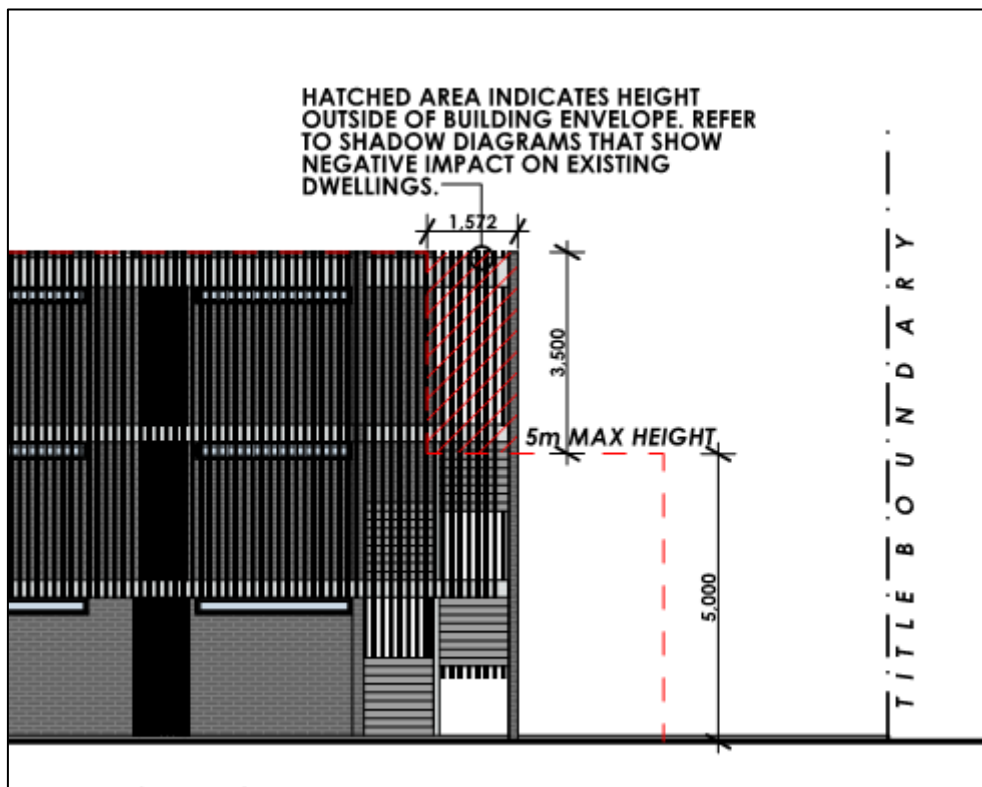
Western elevation showing area greater than 5m high hatched in red
